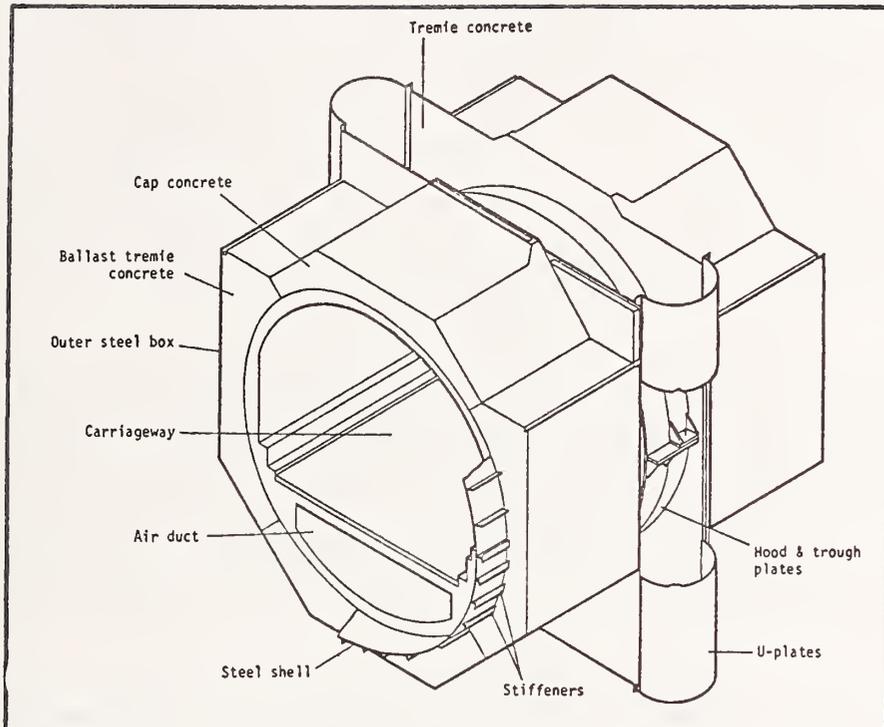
ISOMETRIC VIEW OF A CIRCULAR STEEL-SHELL UNIT AND JOINT
